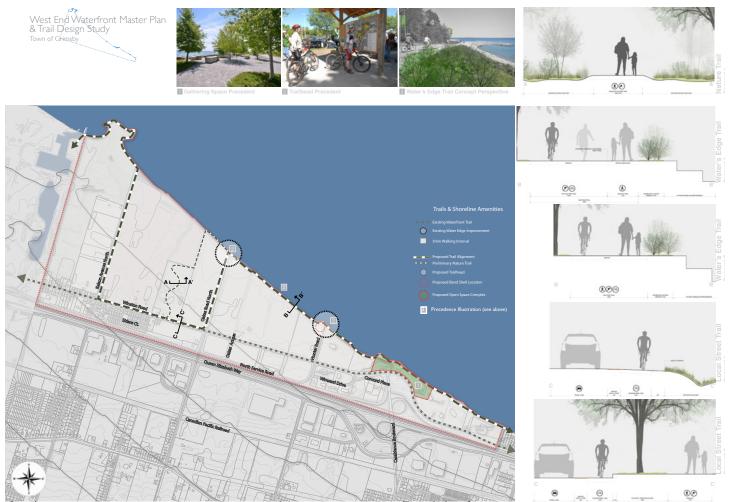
West End Waterfront Trail Plan Proposed Structure
